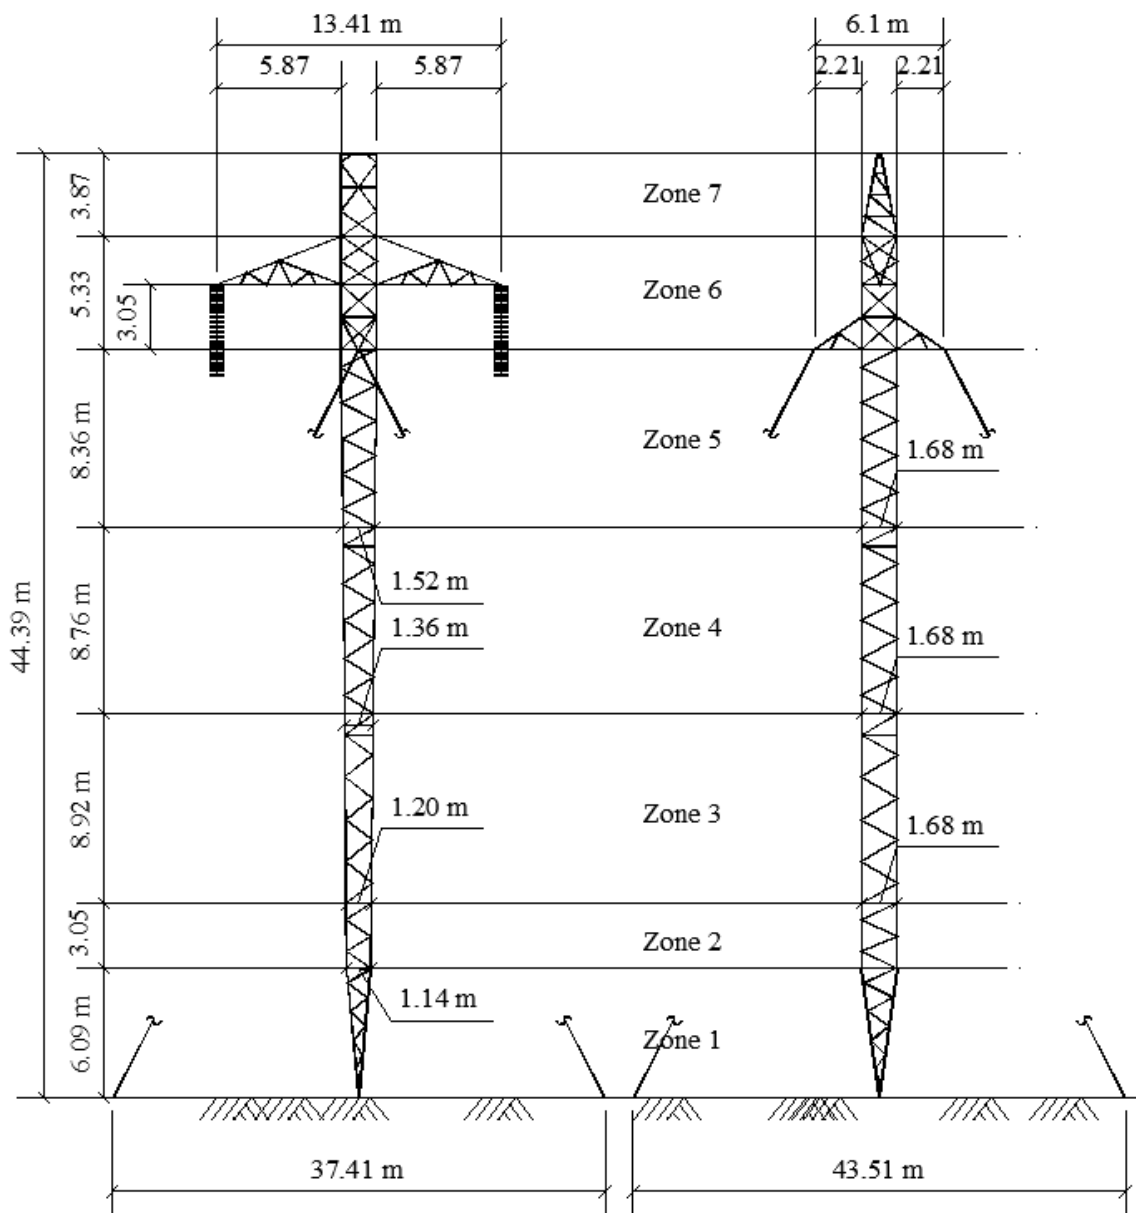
Schematic of the Full-scale Guyed Transmission Tower
